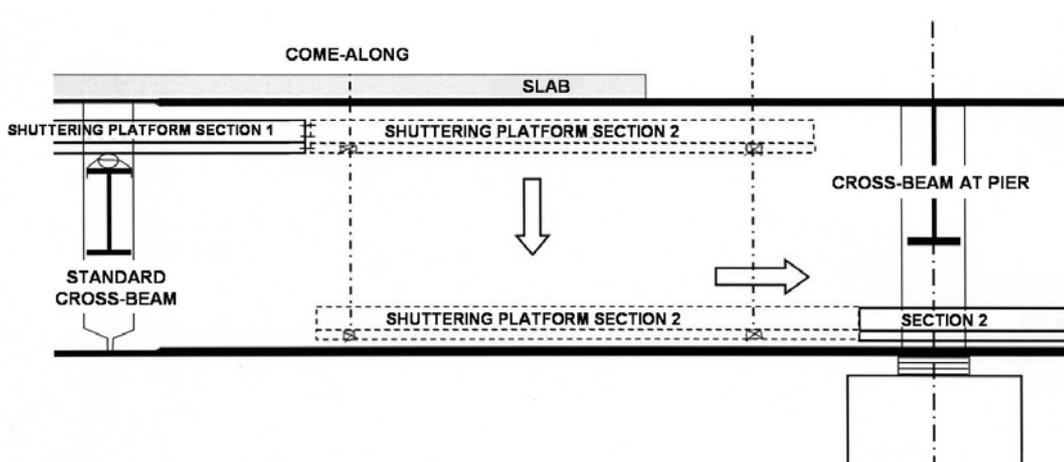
Moving/Dismantling central shuttering platform at pier directly supporting cross-beam
